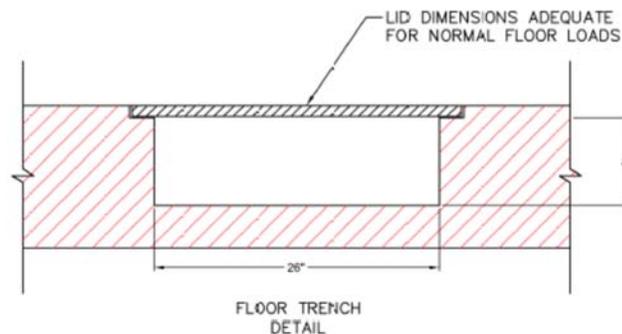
Floor Trench Detail (26" wide x 6" deep from underside of lid).
